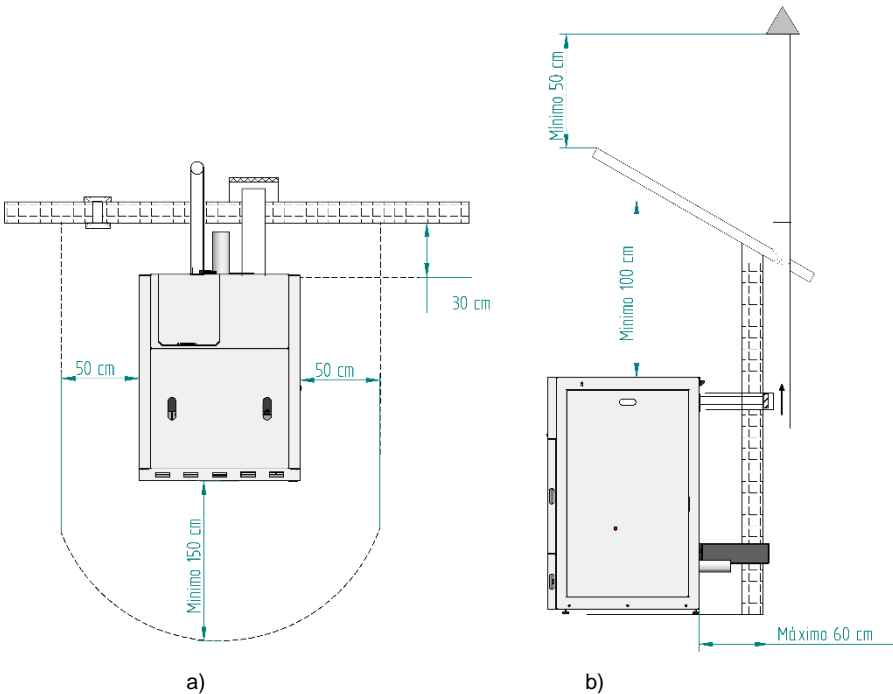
Minimum distances from all surfaces: a) upper view of the unit's installation; b) side view of the unit's installation
